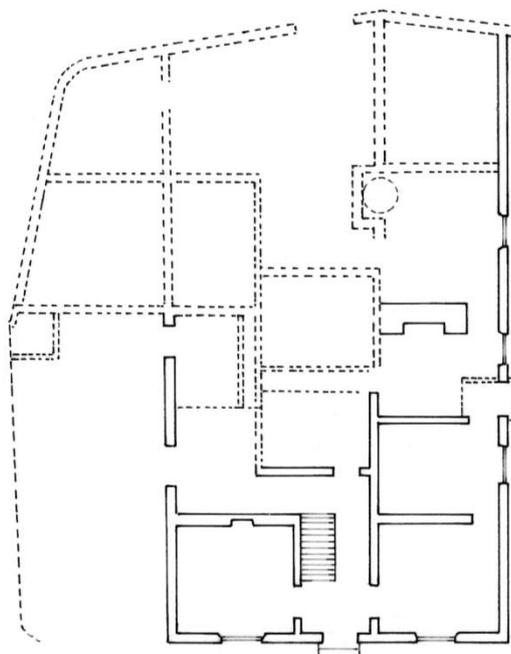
Plan of dwelling, extract from an engineer's plan of the paper mill of 1848 (Nash 2001, 34-5). The plan is stylised and the house is drawn in outline only, without the detail of the paper mill buildings. Note the RAG STORE shown in the position of the present rear wing which has its gable end to Station Road and the circular feature within the north-east range
